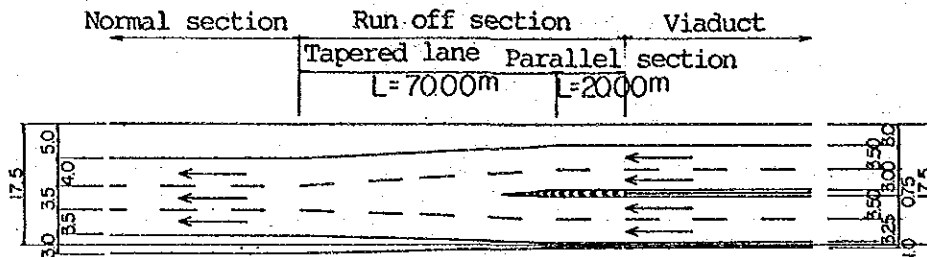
TAPER PLAN OF VIADUCT AND NORMAL SECTION
